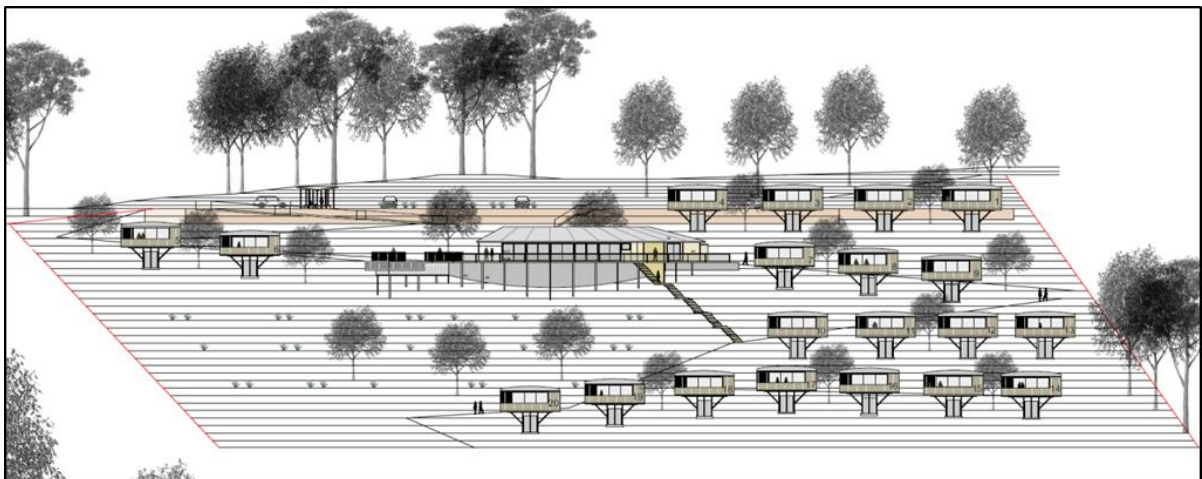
Artist's impression of proposed development (Source: Walknorth Architects 2022)
